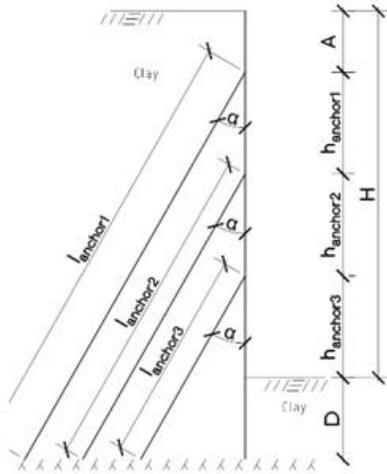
Typical cross-section of retaining wall with parameters as presented in Table 1.
